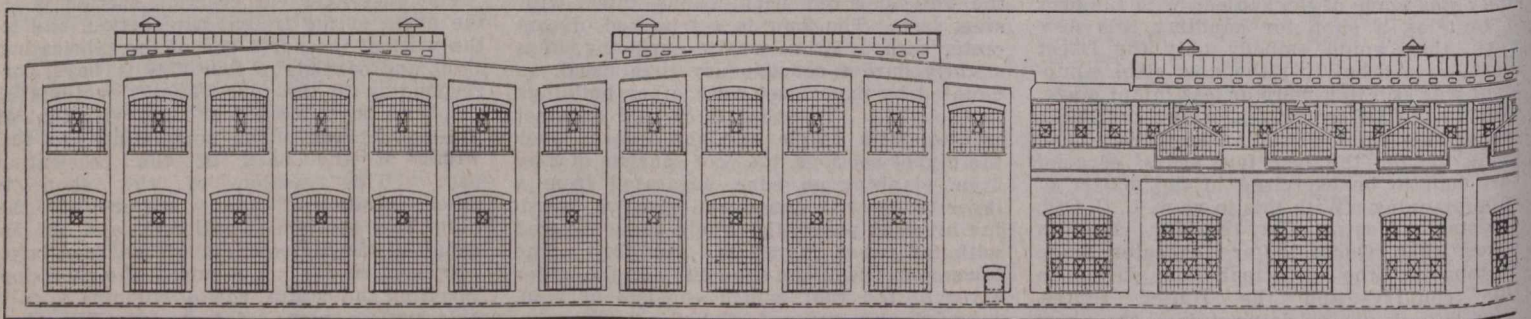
Side Elevation of Steel Car Shop (see opposite page).
